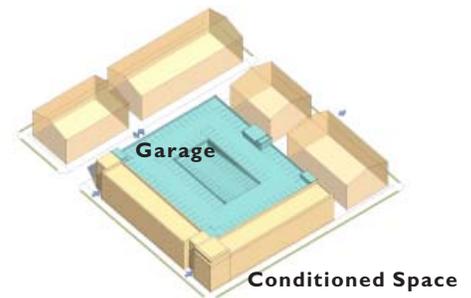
Parking garage screened by conditioned space in liner buildings
